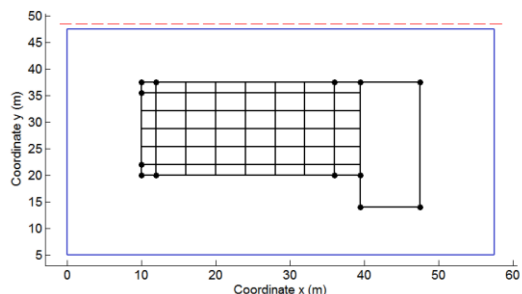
Layout of the sub-systems: substation grounding and metallic fence grounding.
